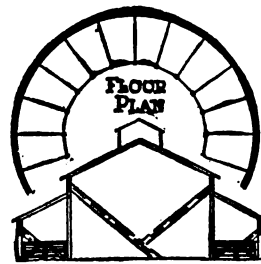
Partial plan and section of round community type. Unless used for storage the central space is apt to be wasted.
